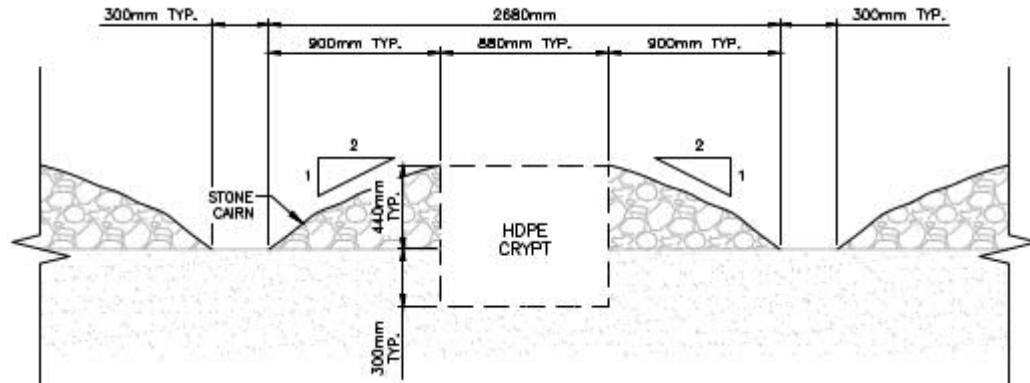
Typical HDPE Crypt Detail with Stone Cairn to the Top
